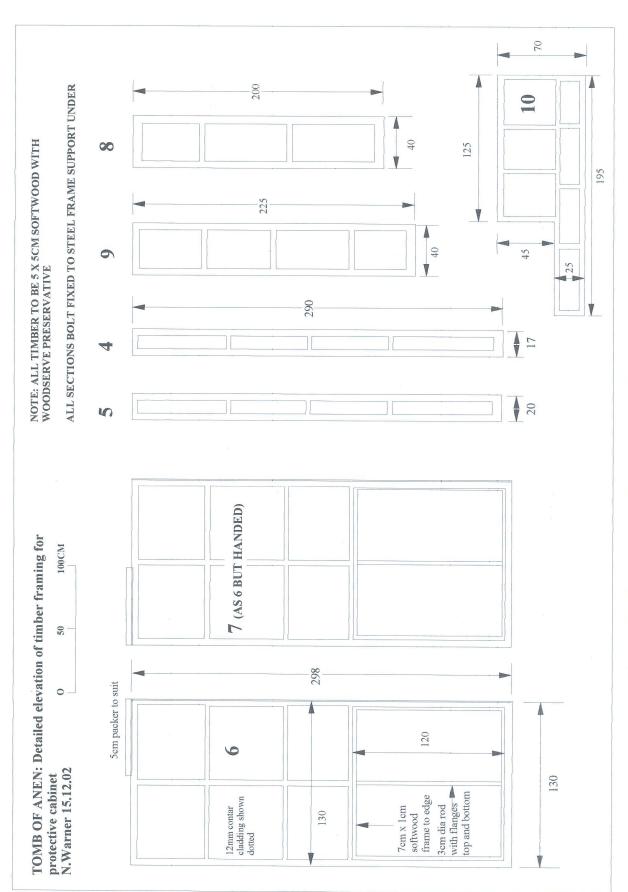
Detailed elevation of timber framing for protective cabinet (2)
